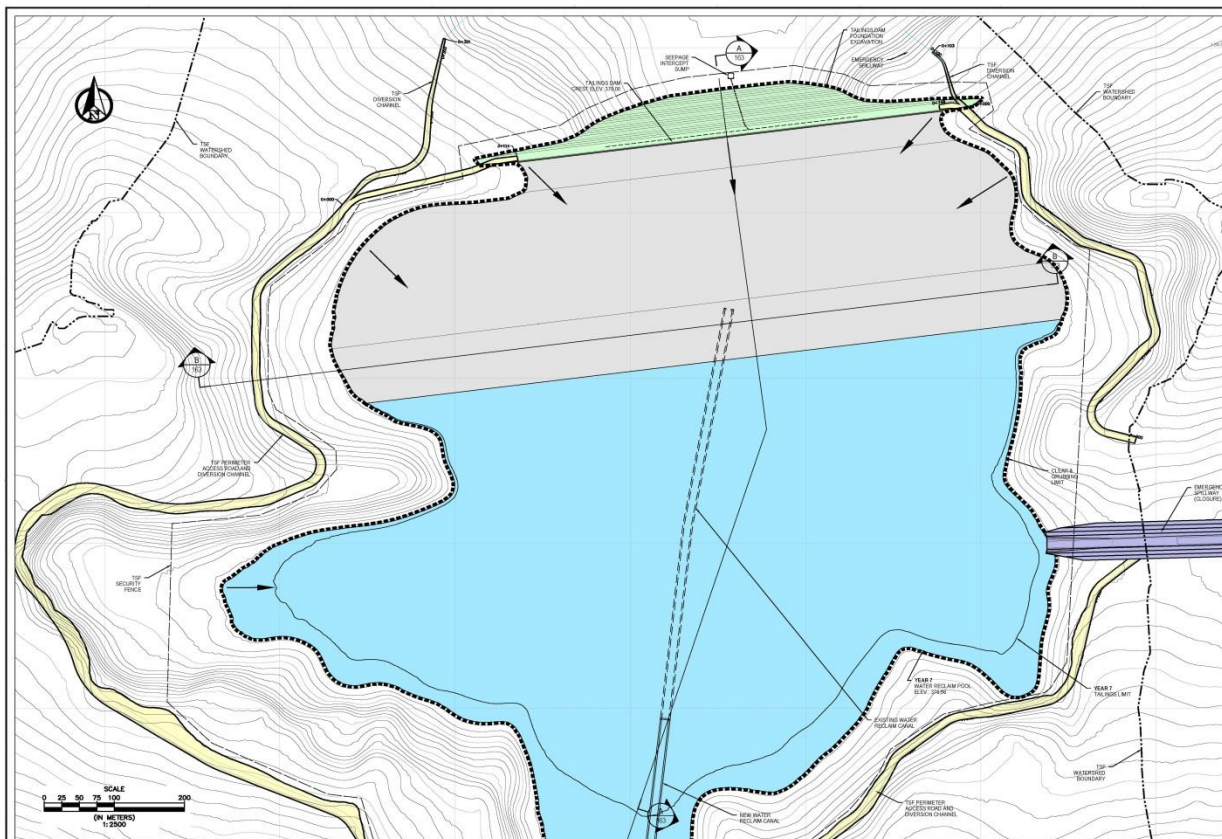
Phase 6 (Ultimate) Tailings Storage Facility Configuration
